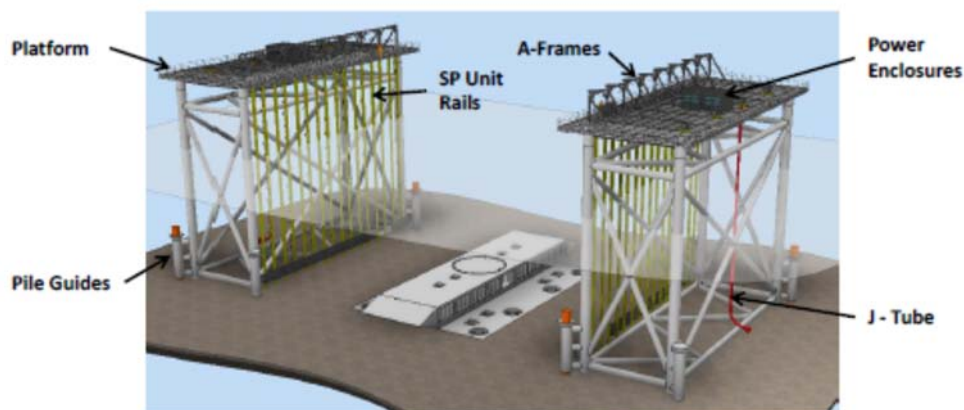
Depiction of SPs mounted on non-subsea piled beam structure
